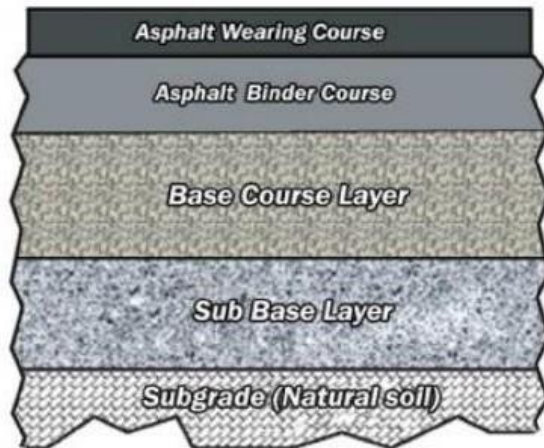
Typical flexible pavement vertical section structure (Mohammed, 2013)
